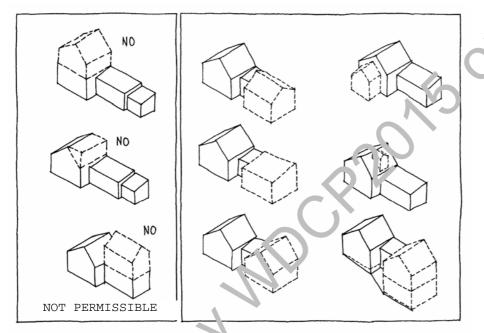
Rear additions to simmic int single-storey dwellings/cottages.
